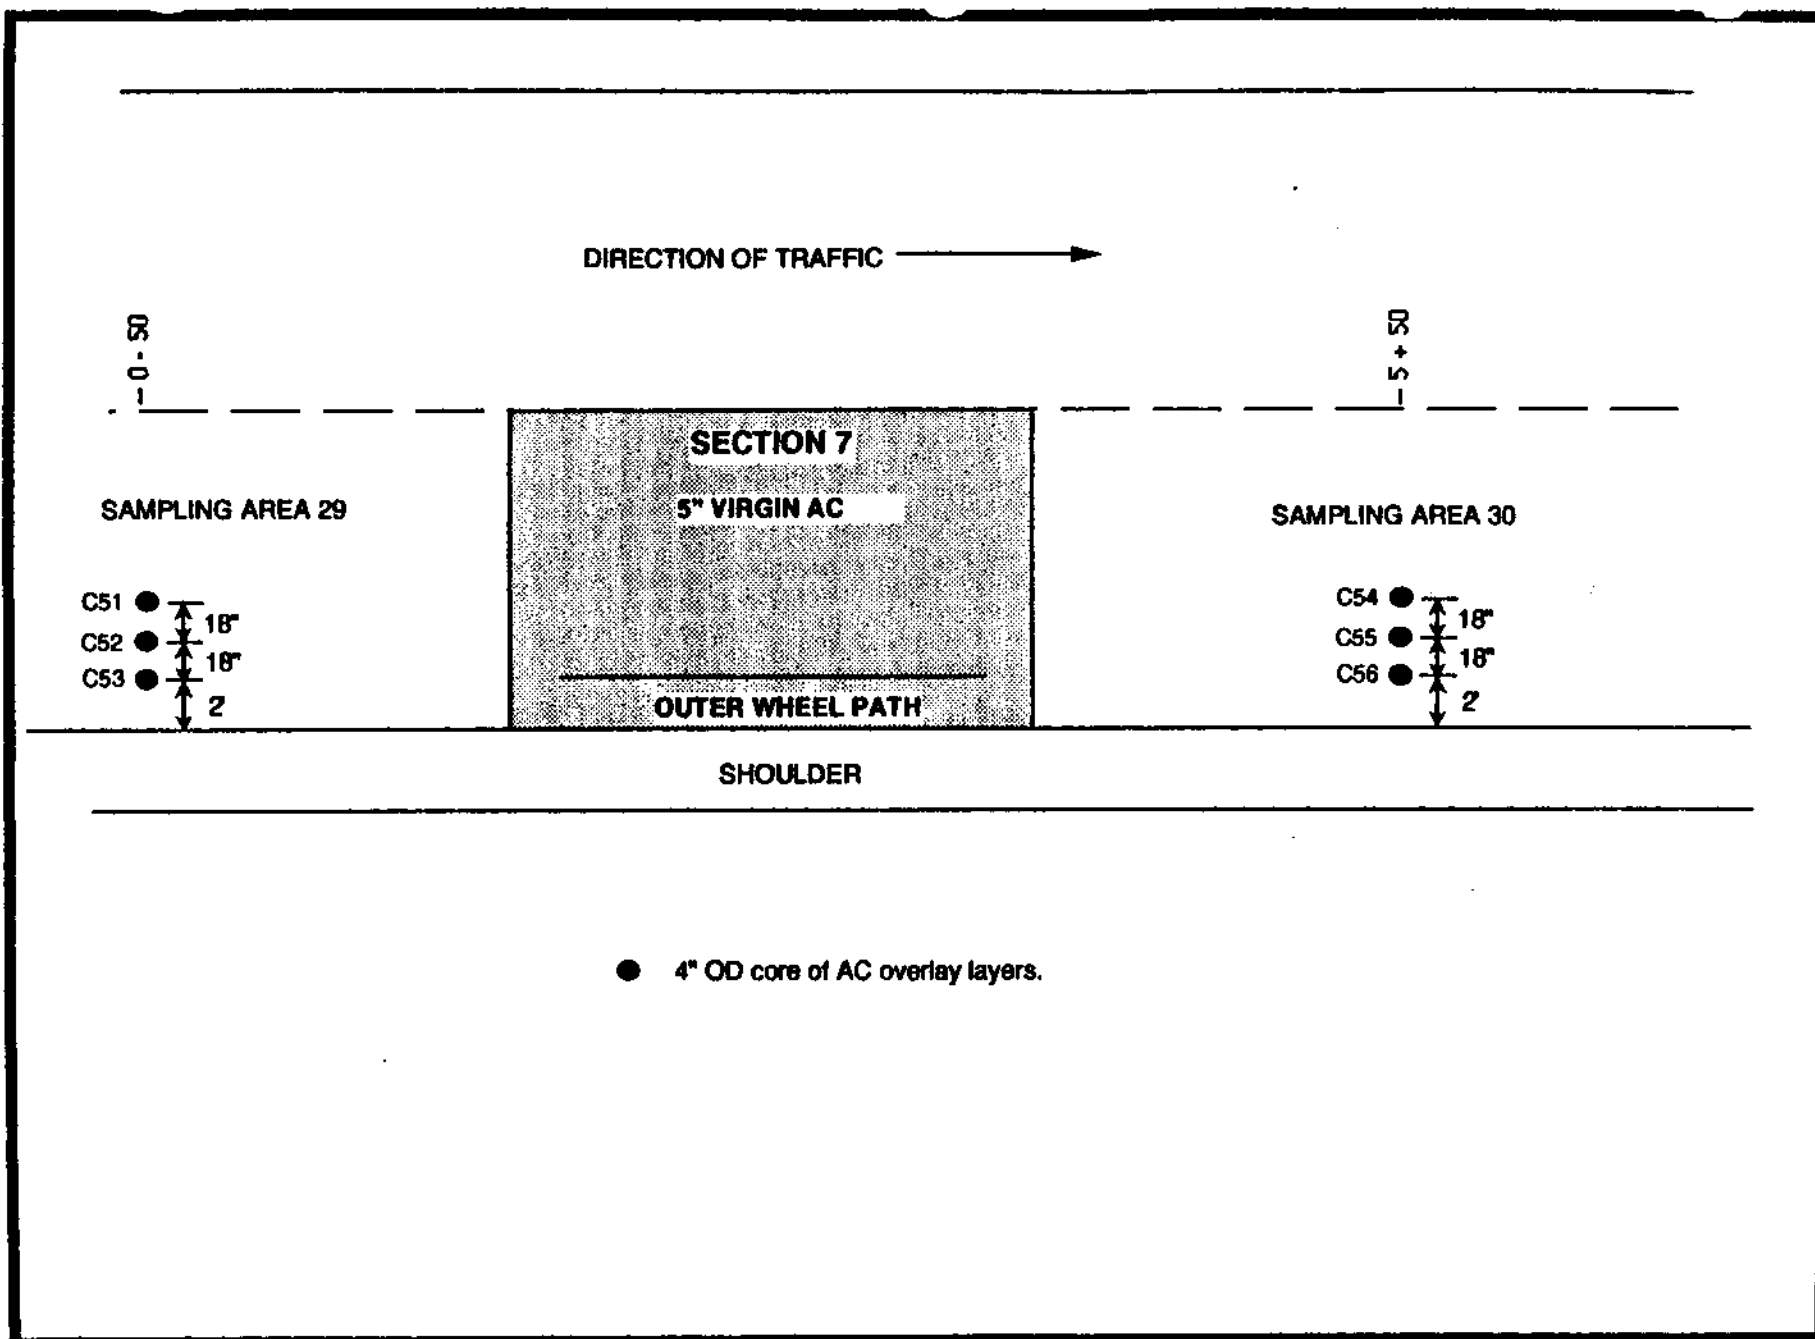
Example of "Post-Construction" Sampling Plan for Section 7.
